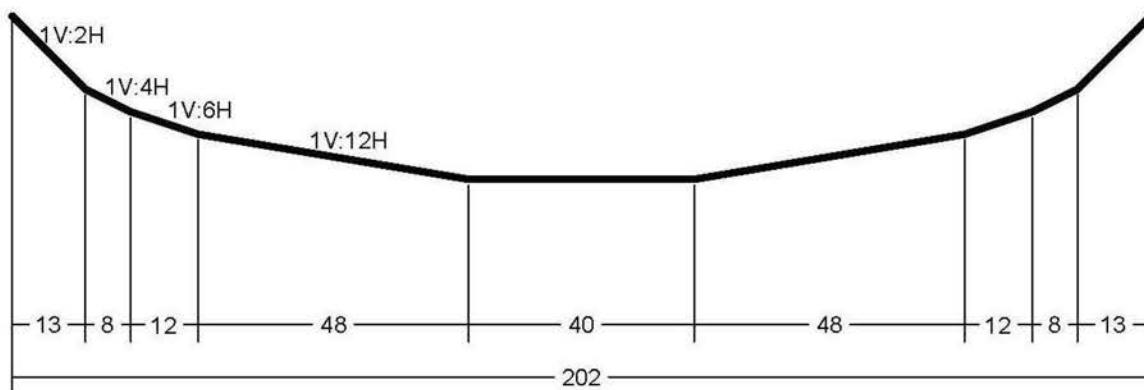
Typical bypass channel section showing slopes and slope widths. Note: the plot's vertical scale is exaggerated by a factor of two.
